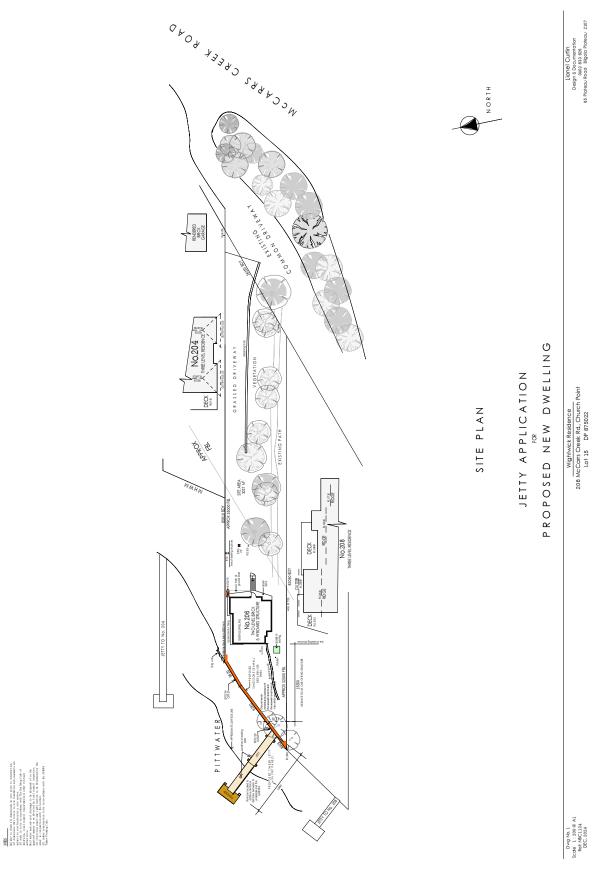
Site plan showing location of proposed jetty, pontoon and seawall
